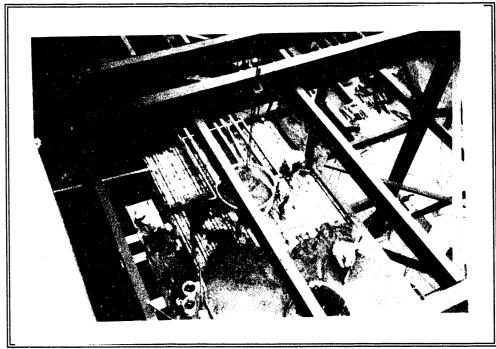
Pouring a concrete floor on the VFB building 2nd level.
